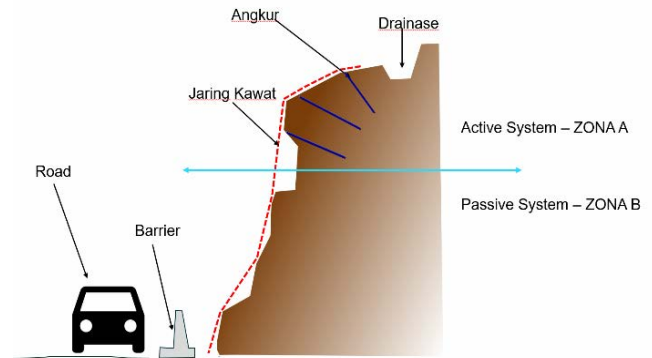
Sketch representing the slope cross section and the type of rockfall protection to be implemented.
